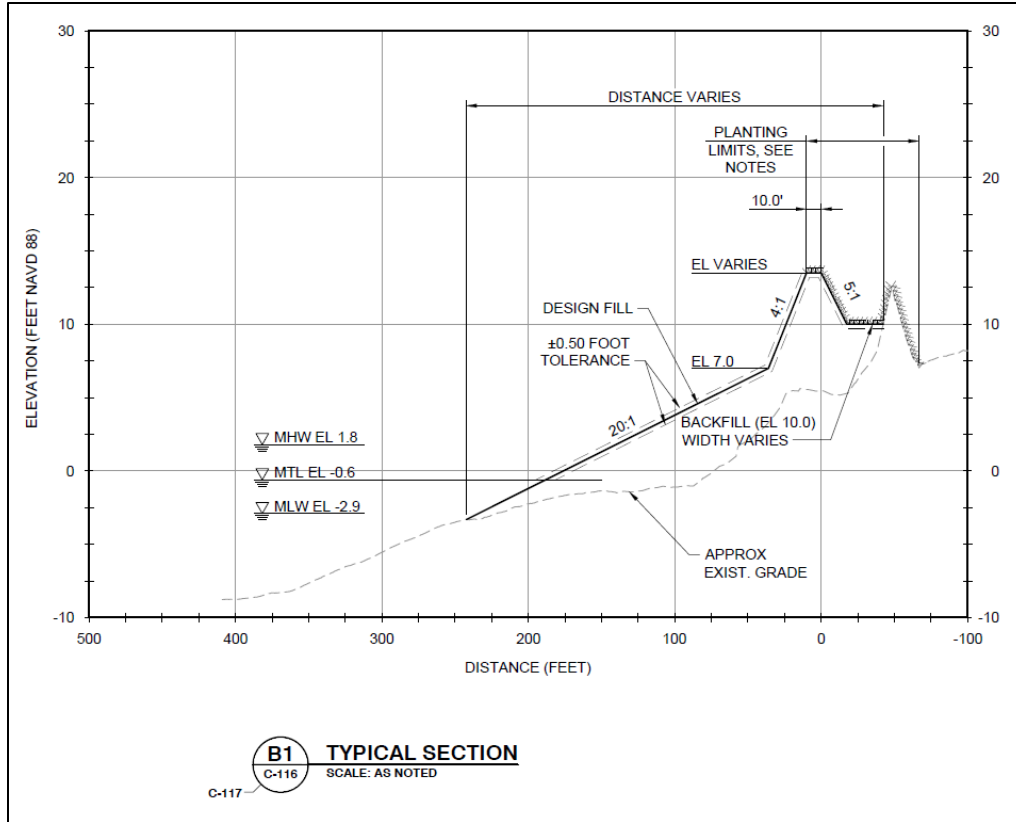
Beach Fill Typical Cross Section – No Berm
